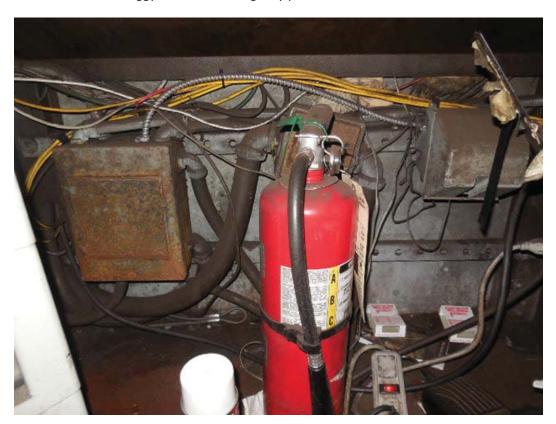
C04 Foggy Bottom – Conduits on Mezzanine ceiling and passing through drop ceiling
